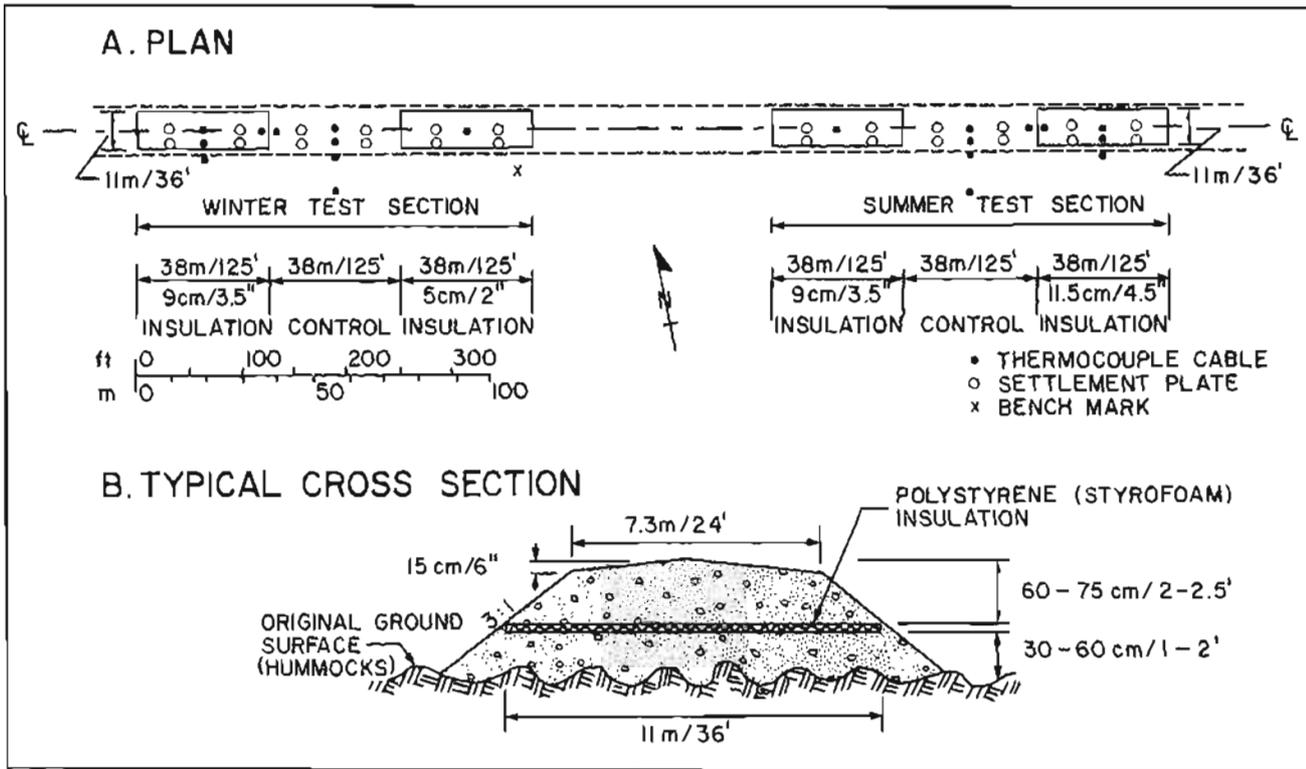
Plan showing the general layout and typical cross section of the insulated roadbed test site at Stop 14, 21 km east of Inuvik (from information supplied by G.H. Johnston, 1982).
